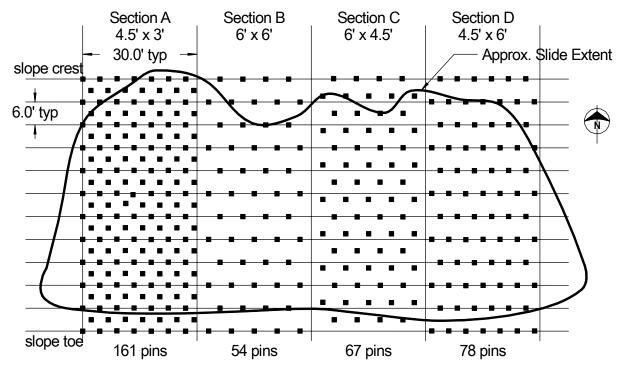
Plan view of selected stabilization schemes for US36-Stewartsville site (Note that all members were installed with vertical alignment).
